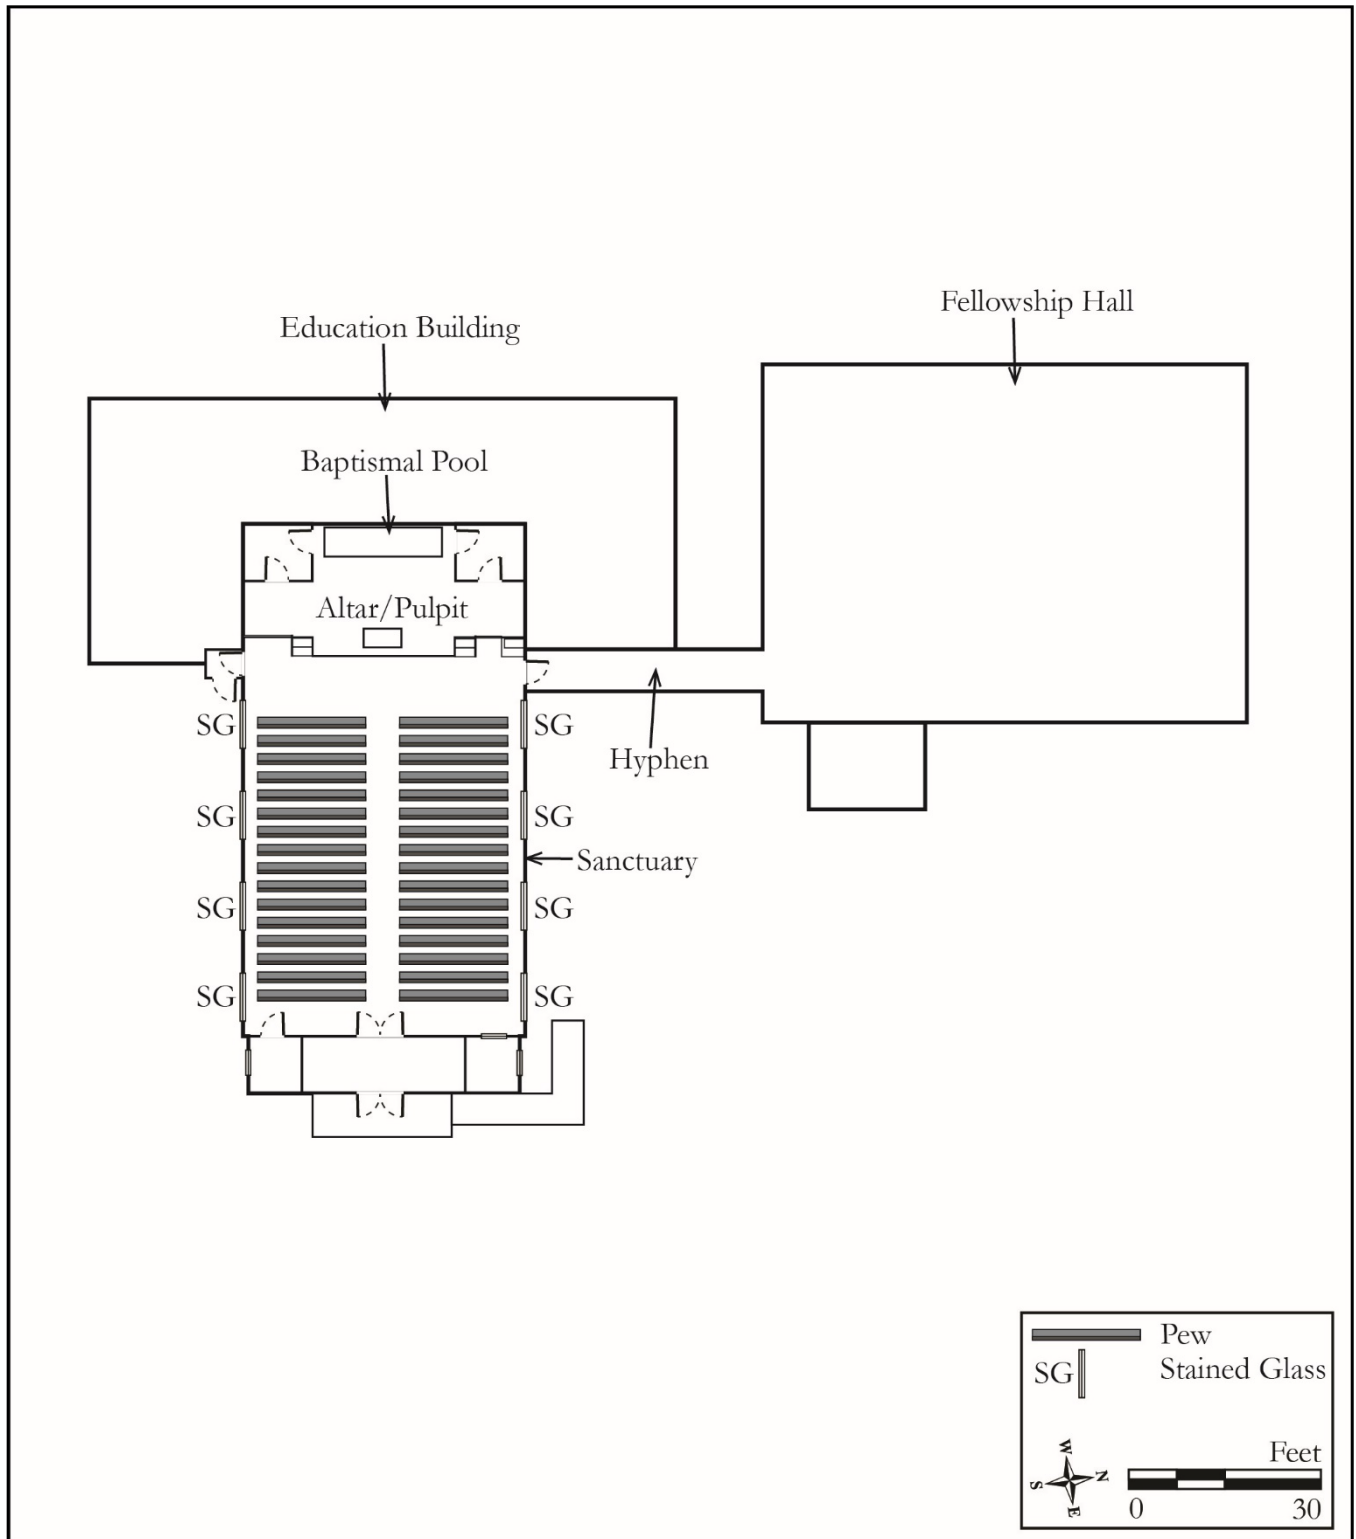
Footprint of Good Hope Baptist Church and floorplan for the Sanctuary (Patricia McEachen, RGA).
